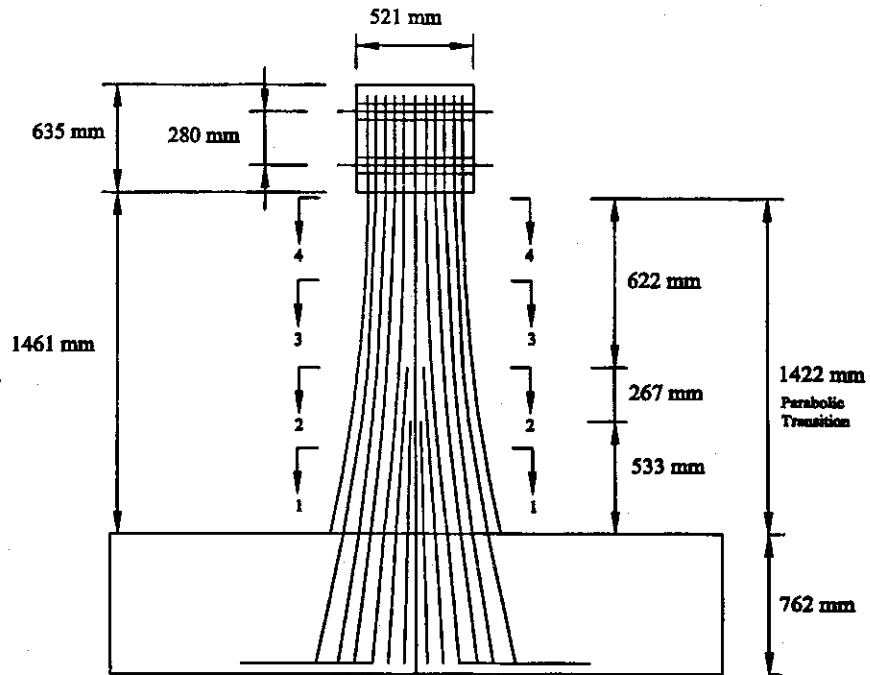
3 Elevation of Thirty Percent Scale Test Specimen
